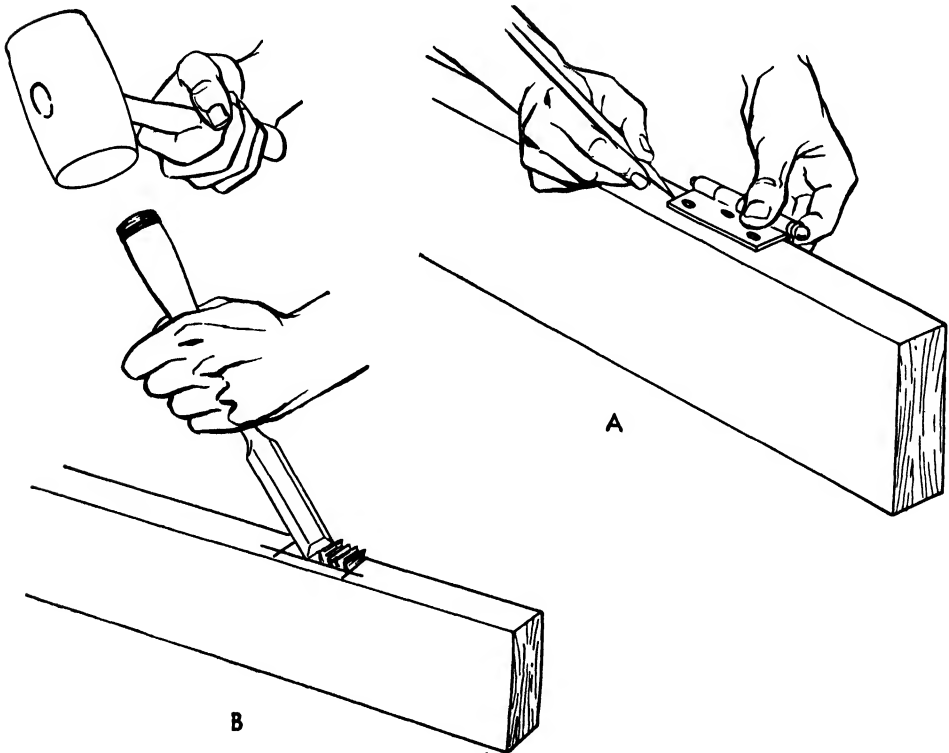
Attaching a butt hinge. A, marking for the gain with a sharp pencil. Some prefer a sharp knife instead of a pencil. B, chiseling out the gain.
